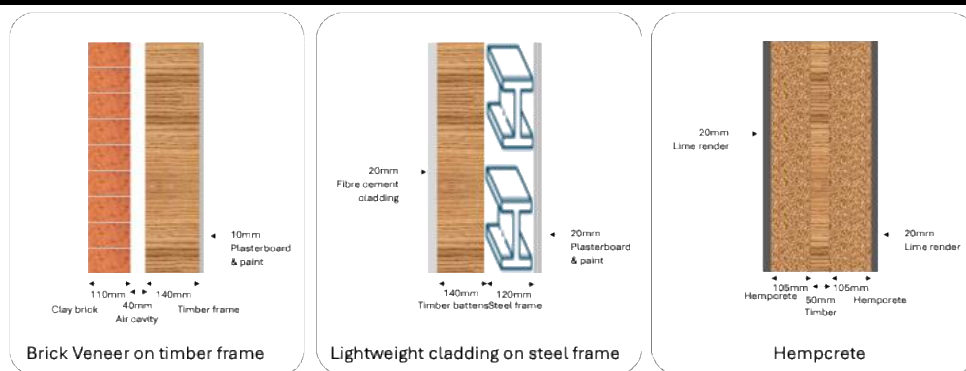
Key components of external non-bearing wall systems (brick veneer, lightweight cladding, and hempcrete). (source: Authors)
